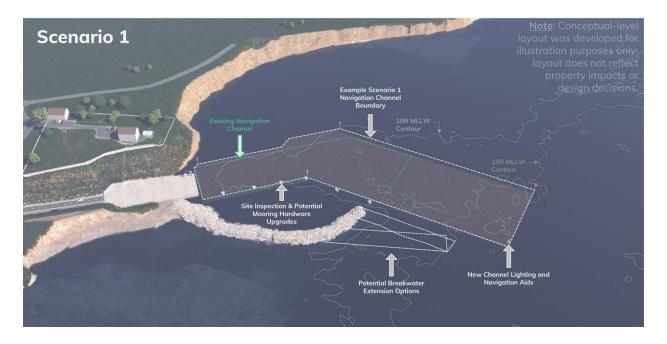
Rendering of VSFB boat dock facility with Scenario 1 concept upgrades.
